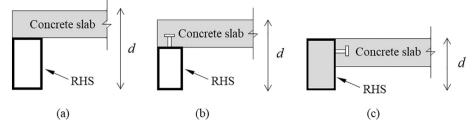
Structural depth d of (a) steel beam (non-composite), (b) conventional composite beam and (b) slim floor concrete filled composite beam.
